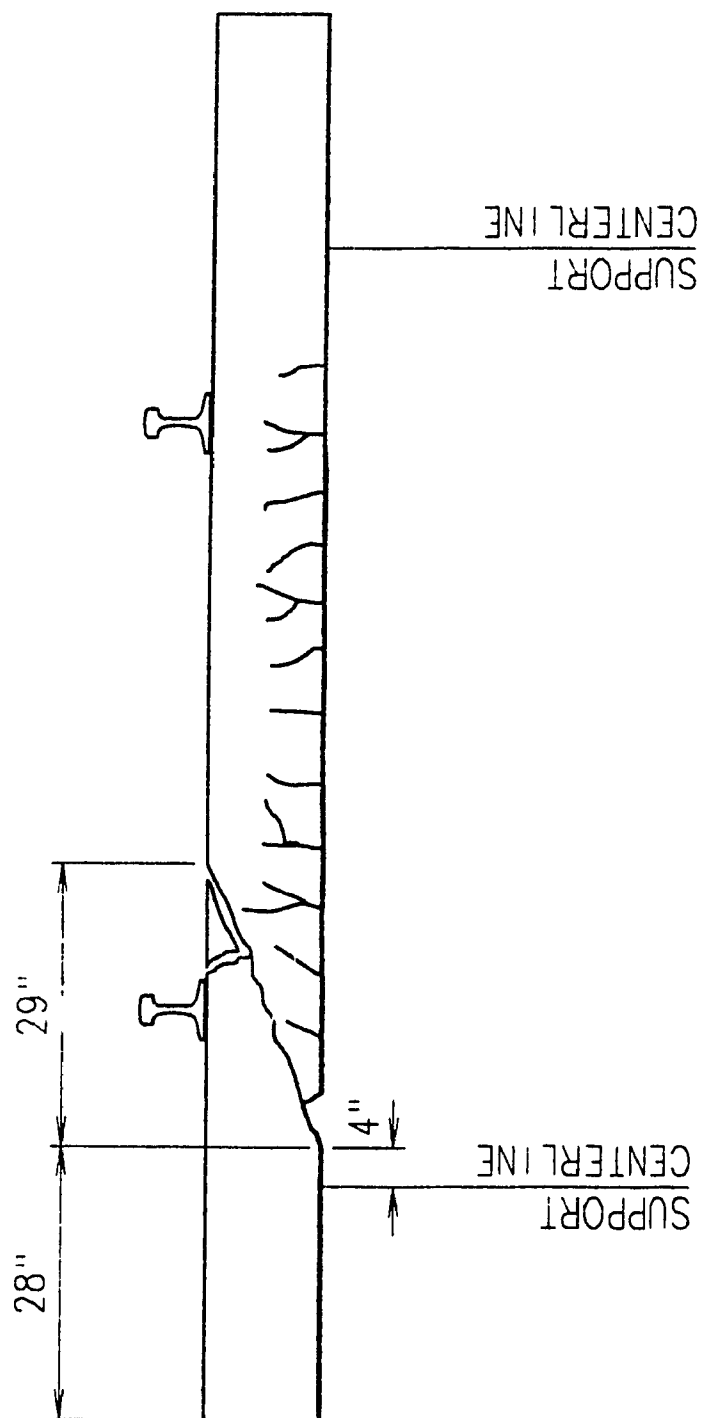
Diagram of Typical Failure Mode of a Laboratory Tested Tie
